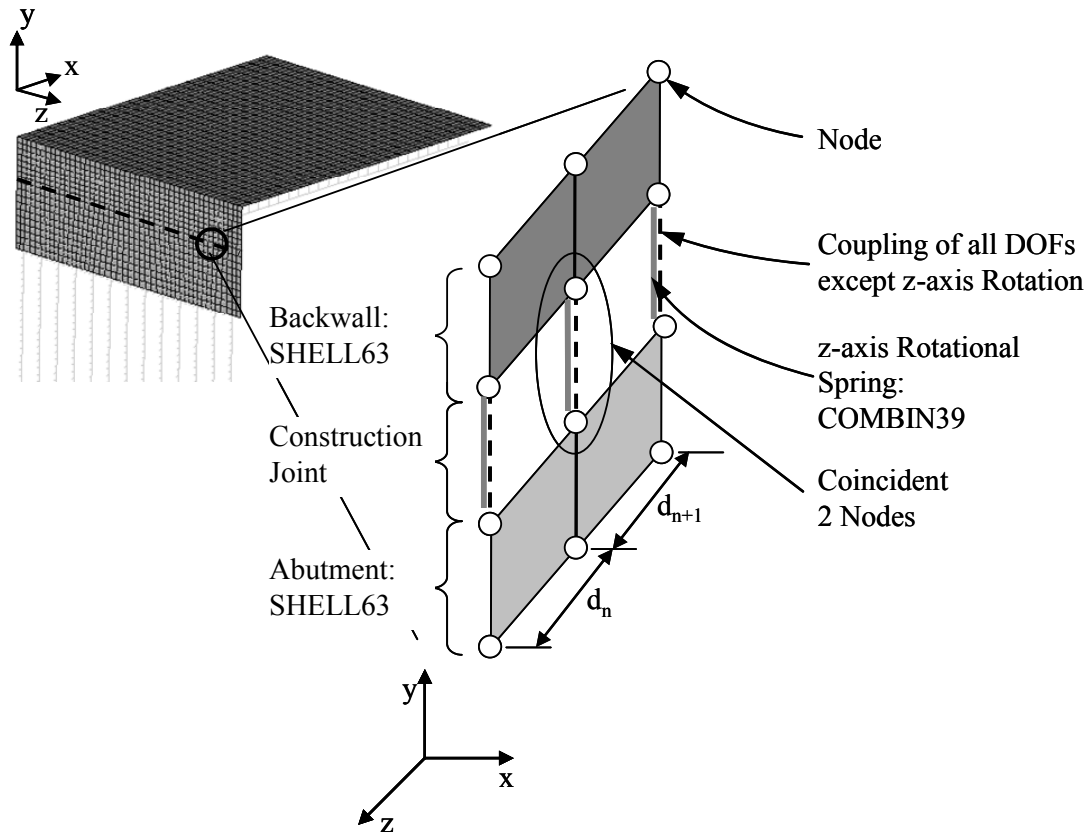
Example 3 Abutment to Back-wall Construction Joint Modeling
